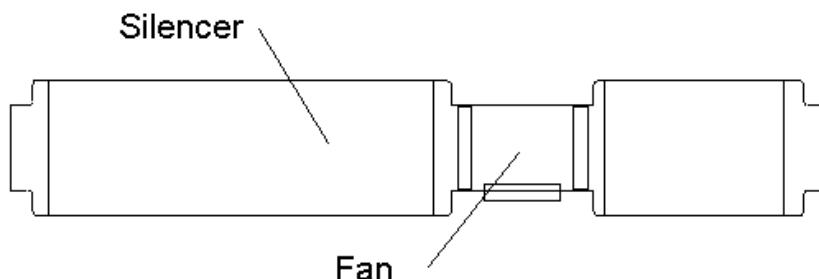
Drawing of a typical WJ-200KIT / WJ-200NKIT assembly. (WJ-150KIT would have 2 silencers of equal length.)
